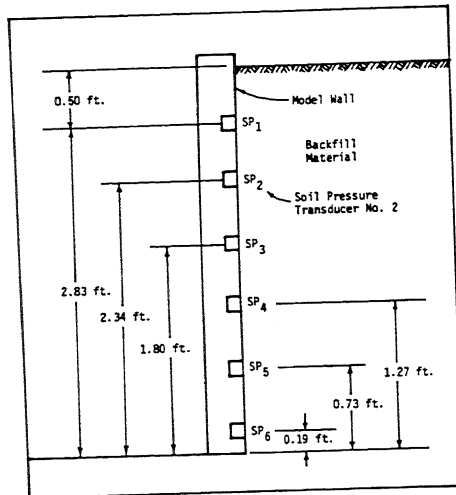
Locations of Earth Pressure Transducers Behind the Rigid Center Wall.
